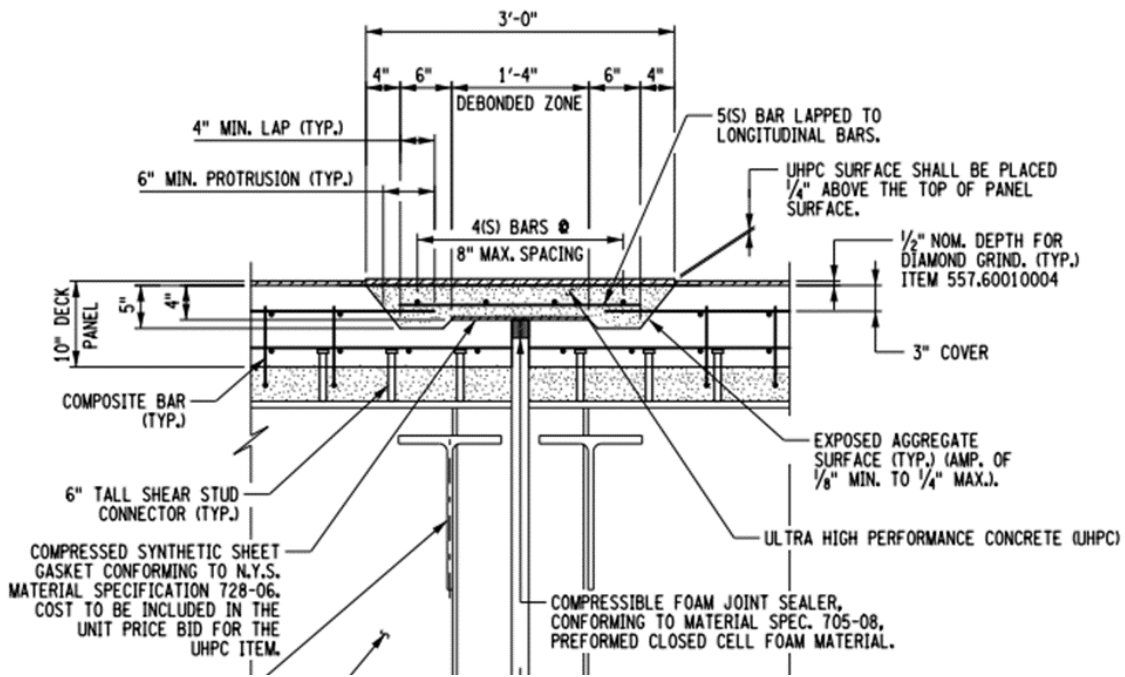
UHPC link slab detail for new construction (NYSDOT)
